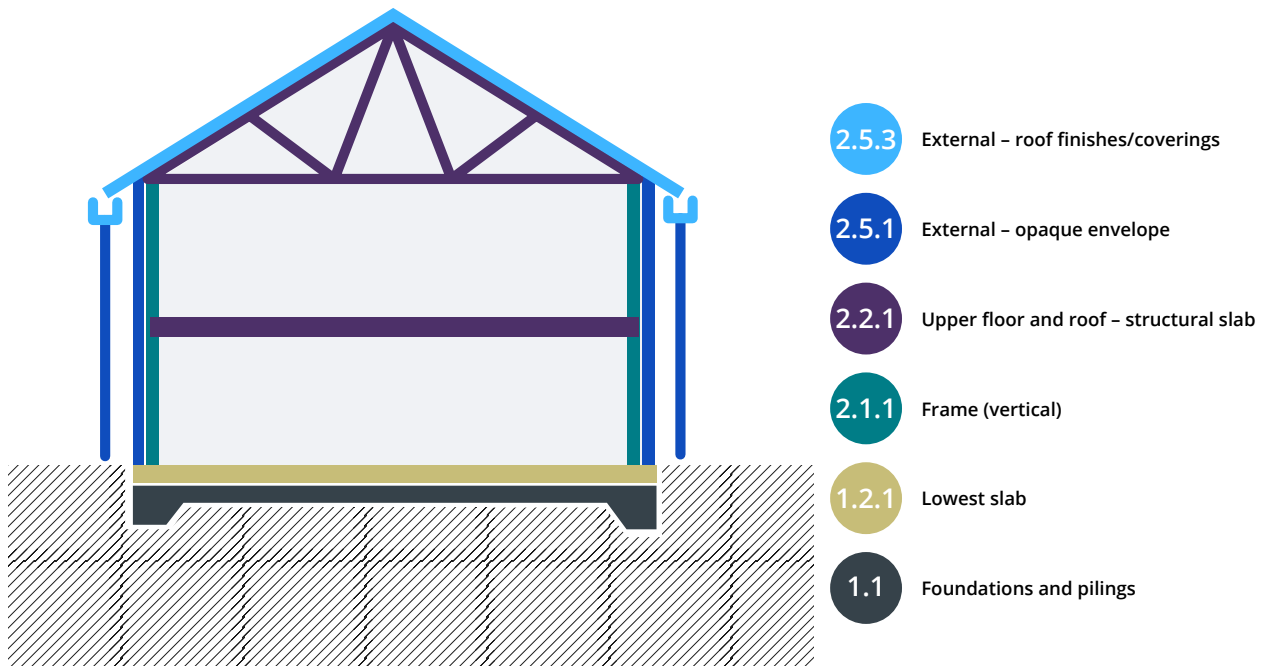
Typical domestic or low-rise building asset, showing designation of structural and external envelope building elements
